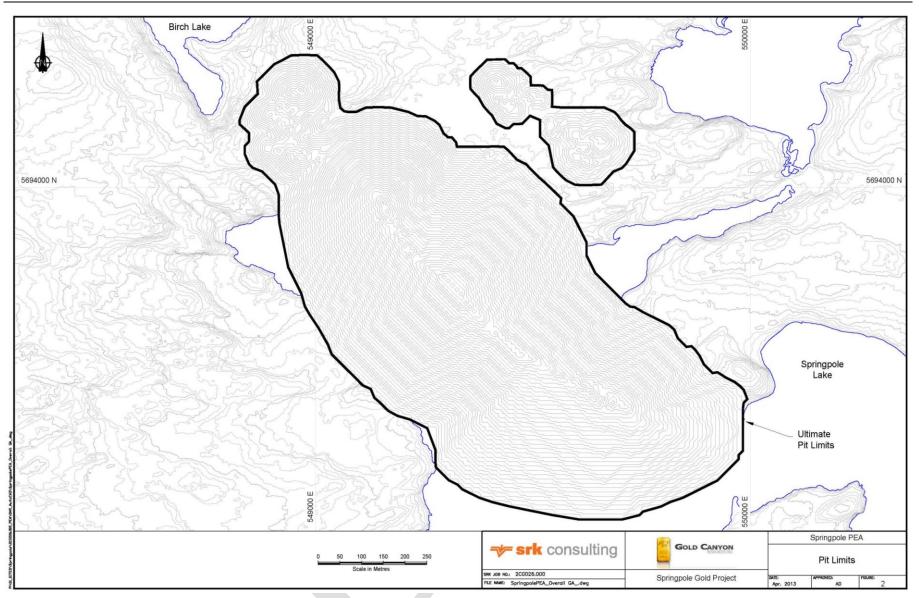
Plan View of Springpole Ultimate Pit Limits
